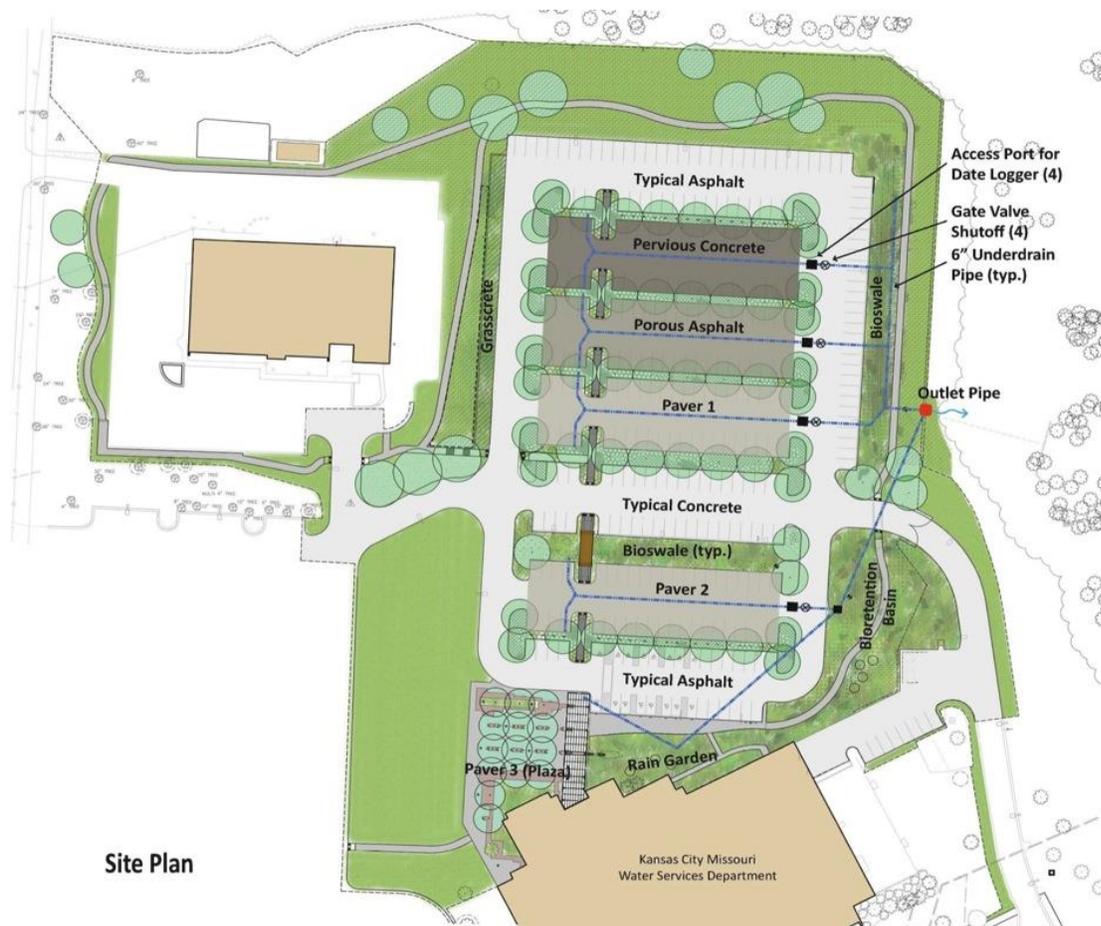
Parking lot and location of four pervious parking bays with underground water storage cells, control valving, and pipe connections to outfall. (BNIM, adapted by Tim Kellams 2016)
